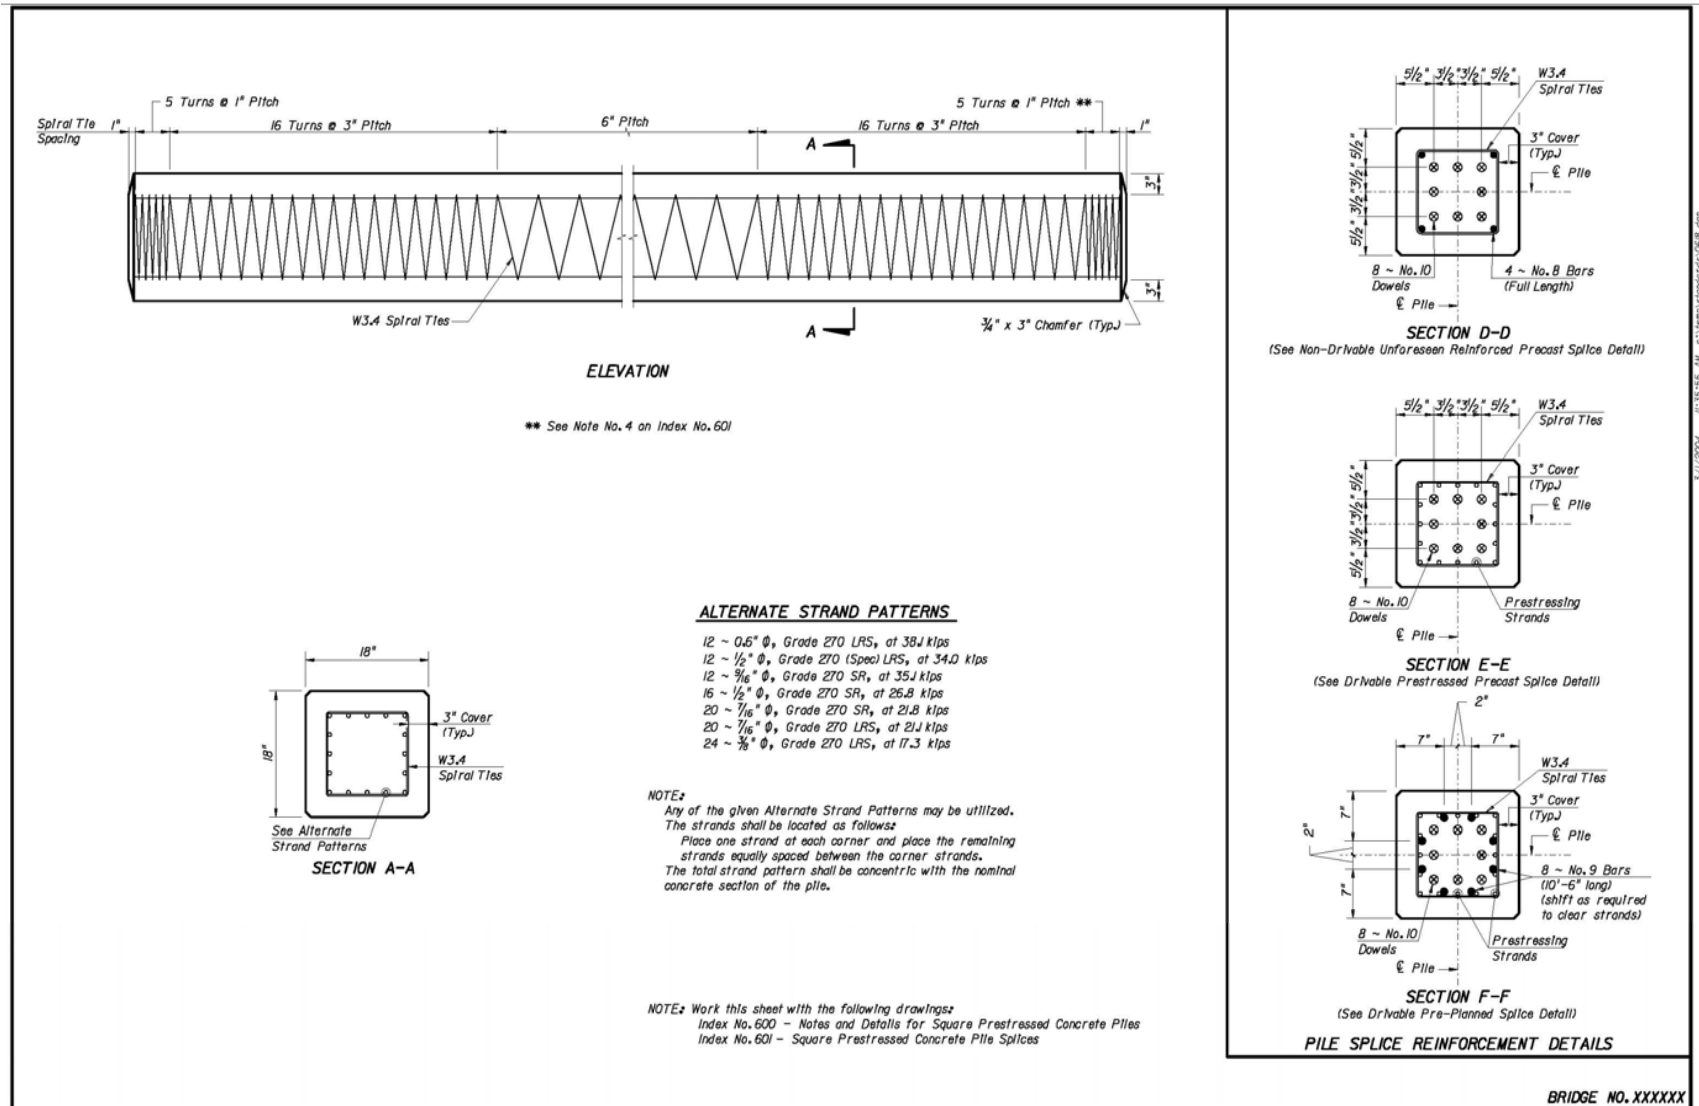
Details of 18 inch Square Prestressed Concrete Piles (Florida-DOTD 2004)
